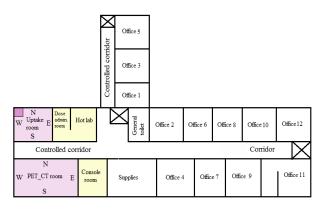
Considered room layout of PET-CT facility in NCCM. This figure is used in this hand calculation.
